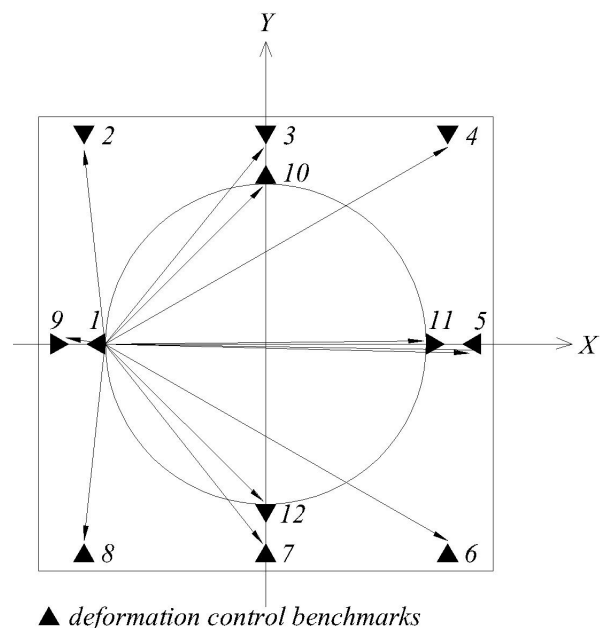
Layout of deformation control benchmarks (through example of a foundation slab of a reactor building of a nuclear power plant)
